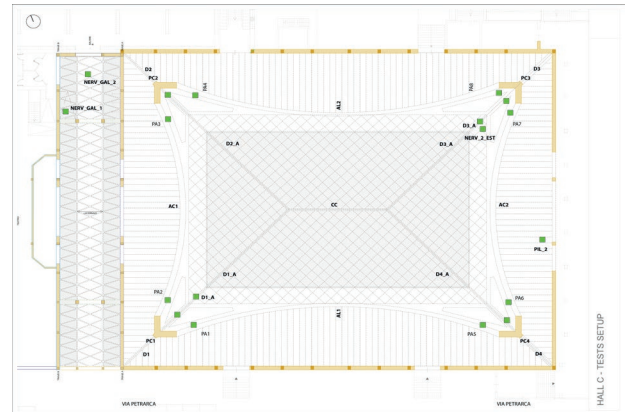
| Floor plan of the hall with the main locations of testing by means of non-destructive measurements.
